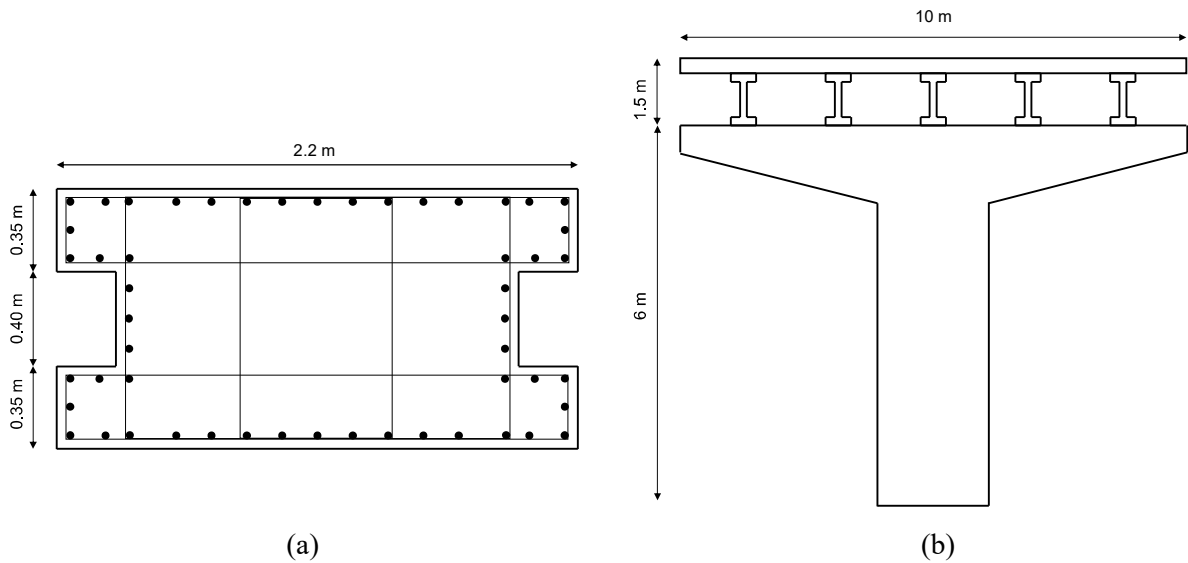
(a) Cross section of the pier, (b) Shaft of the pier and cross section of the upper deck.
